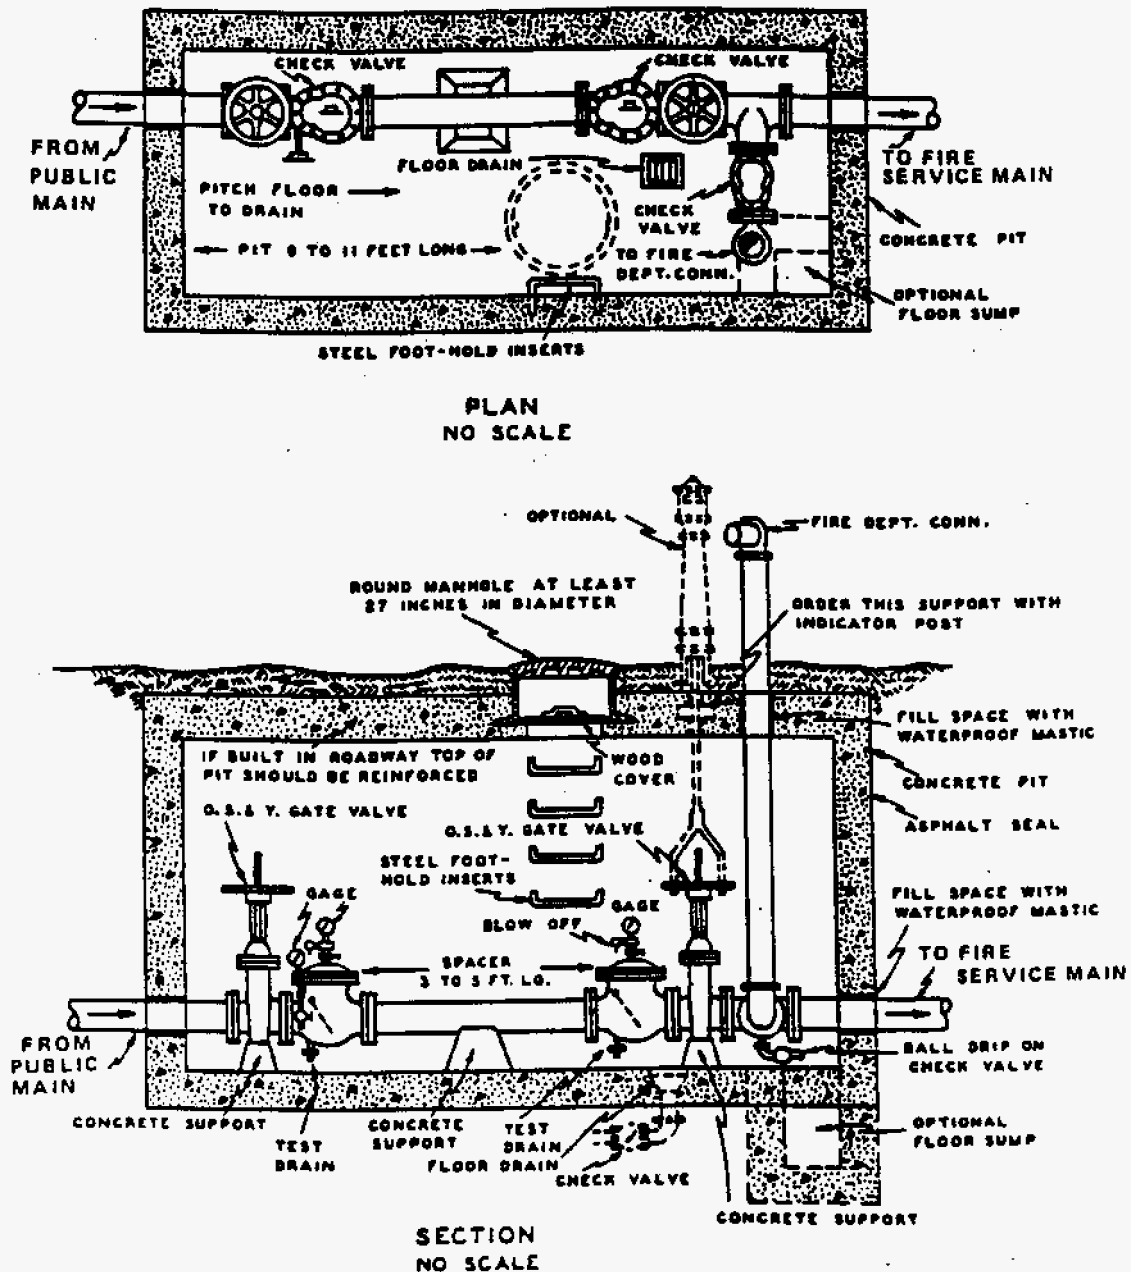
(c) Typical City Water Pit — Double Check Valve Arrangement.
